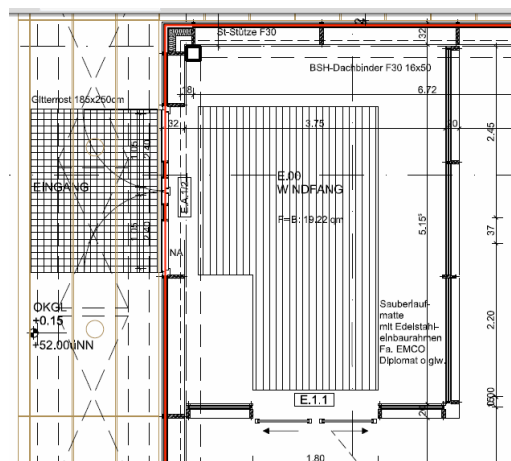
Clean-out zone in the building entrance, detailed section of the ground floor plan (source: ntspv)
